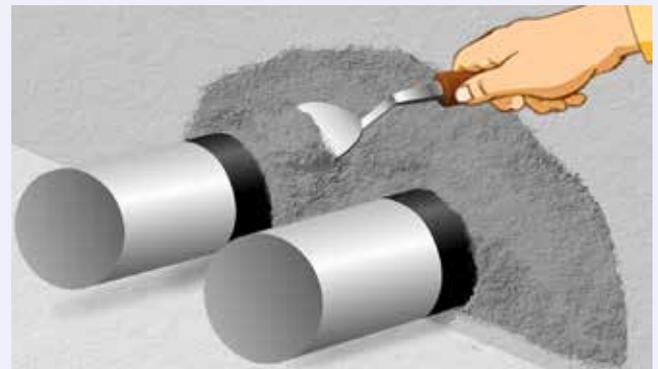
Fixing the pipes with sealing tape and further doing the grouting
